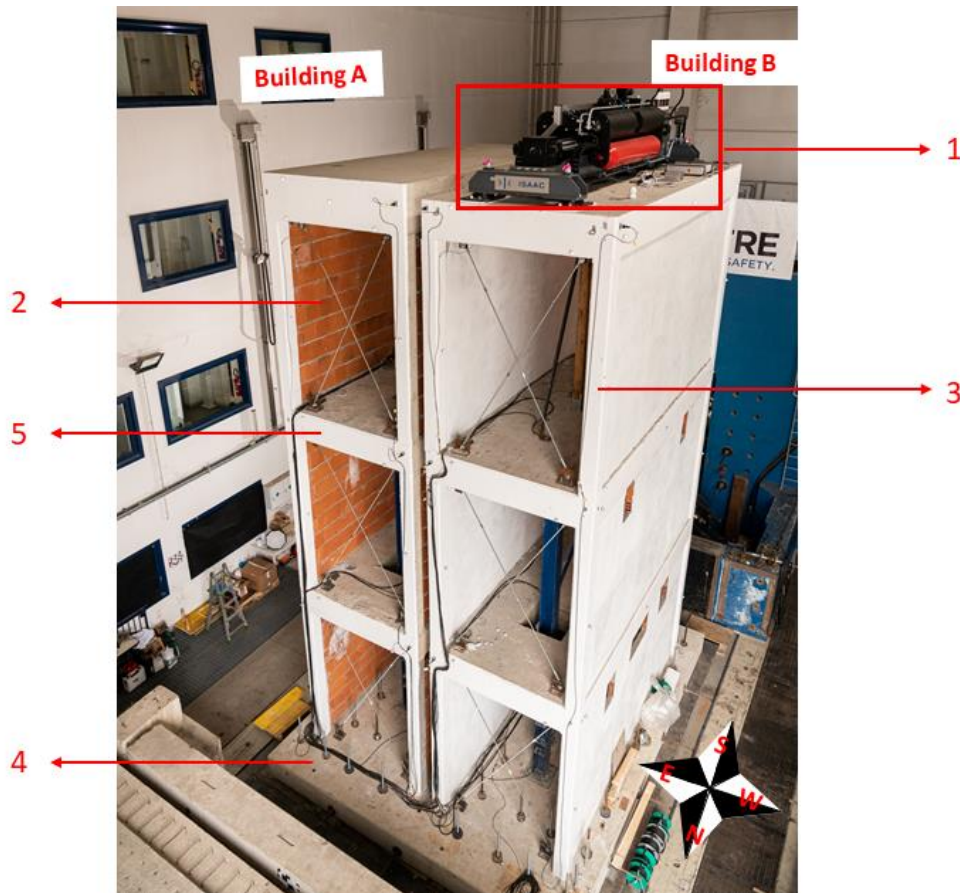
The buildings tested in the Eucentre laboratory: 1) AMD; 2) masonry infills; 3) columns; 4) foundation slab connected to the shake table; 5) floor slabs.
